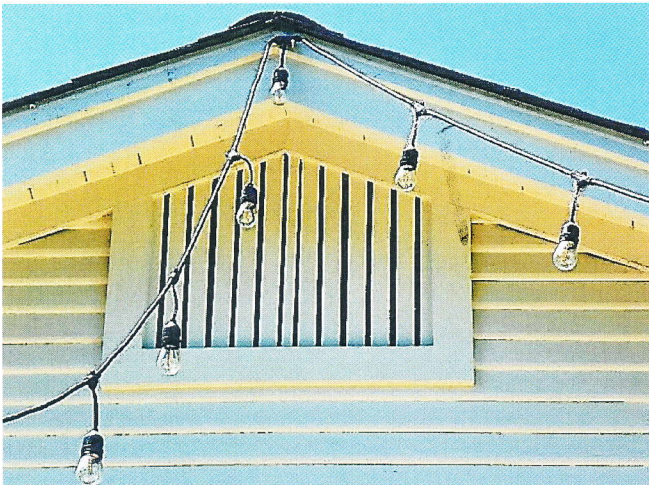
3093; View: Wooden horizontal Attic Vent;
